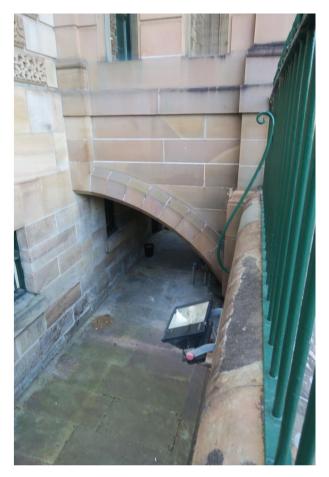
Eastern façade (Macquarie Street) basement level light well
